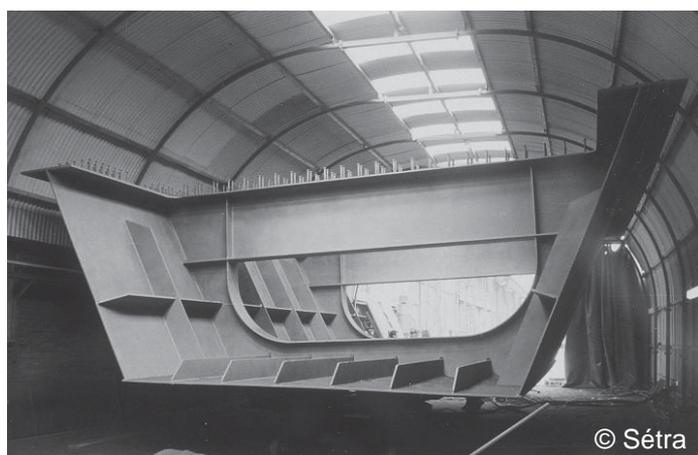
Box-girder with open stiffeners, Lille, France.
